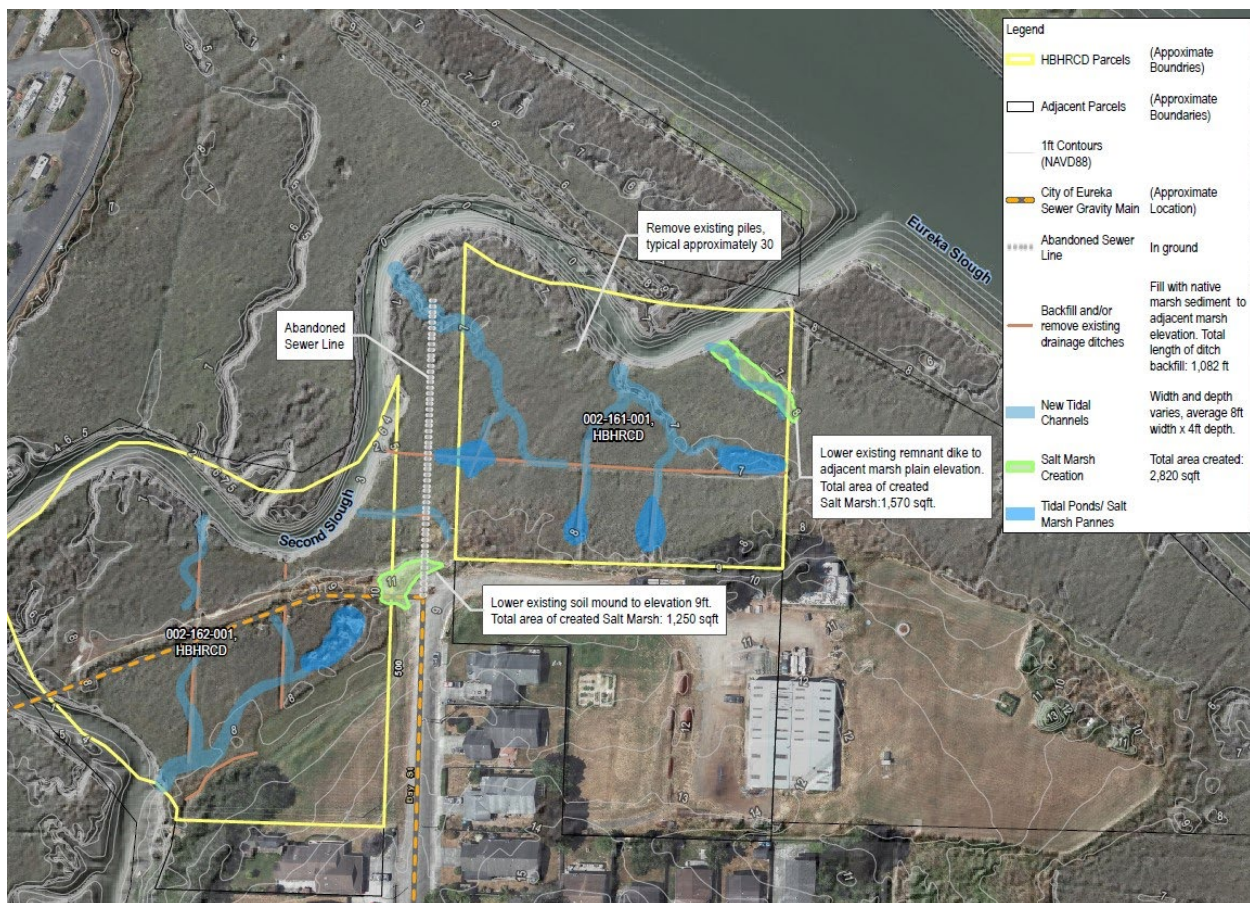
Conceptual design plans for the Bay Street Tidal Restoration and Enhancement action proposed to provide compensatory mitigation.
